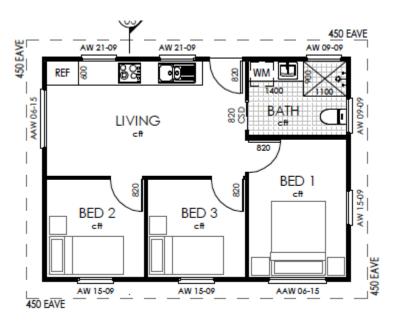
LAYOUT (SUNRAI DESIGNS)
